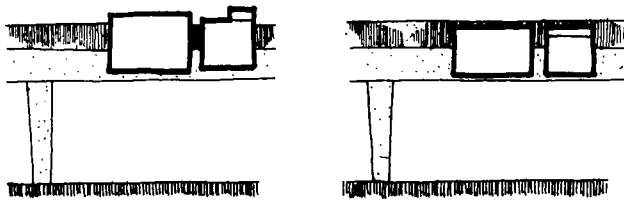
As a last resort, attach signs to a bridge, but keep them within the silhouette of the bridge.
